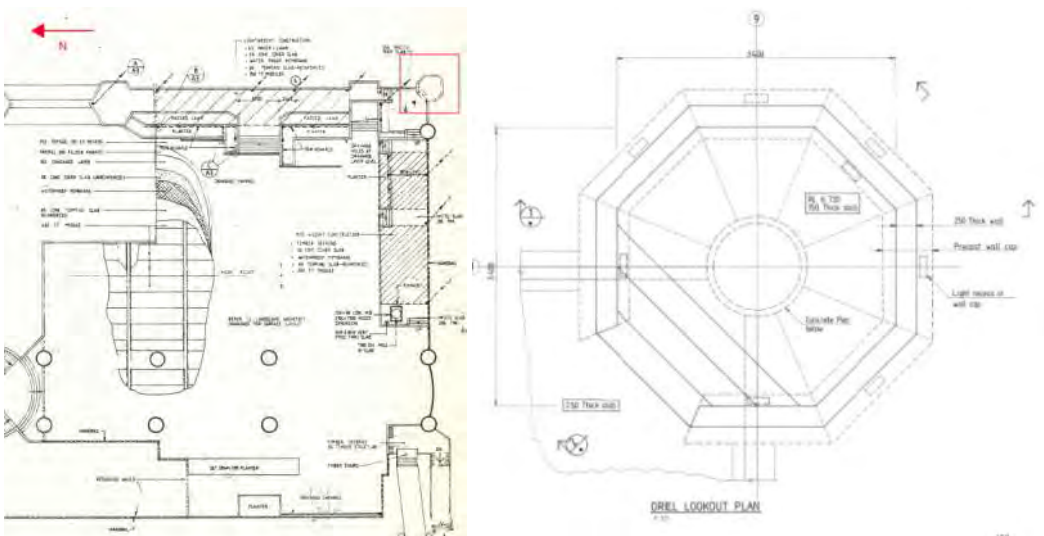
Extract from as-built drawing A1 and S10 - location and plan of look-out tower
